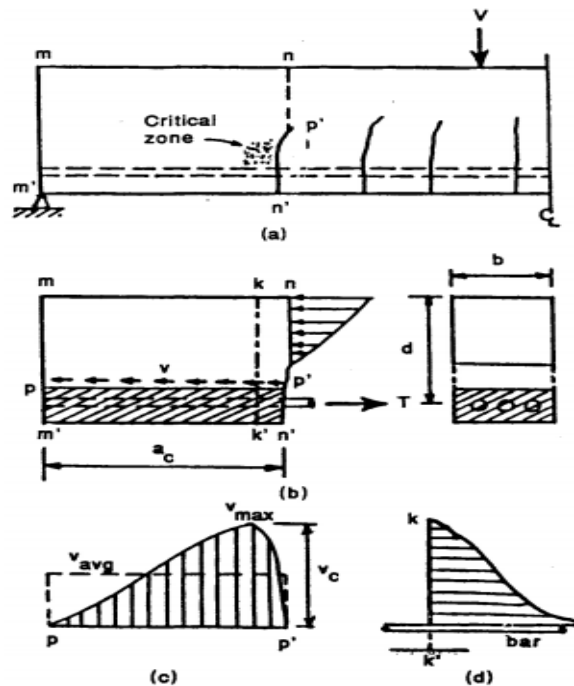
Shear stress in reinforced concrete beam(Kim & White, 1991)
